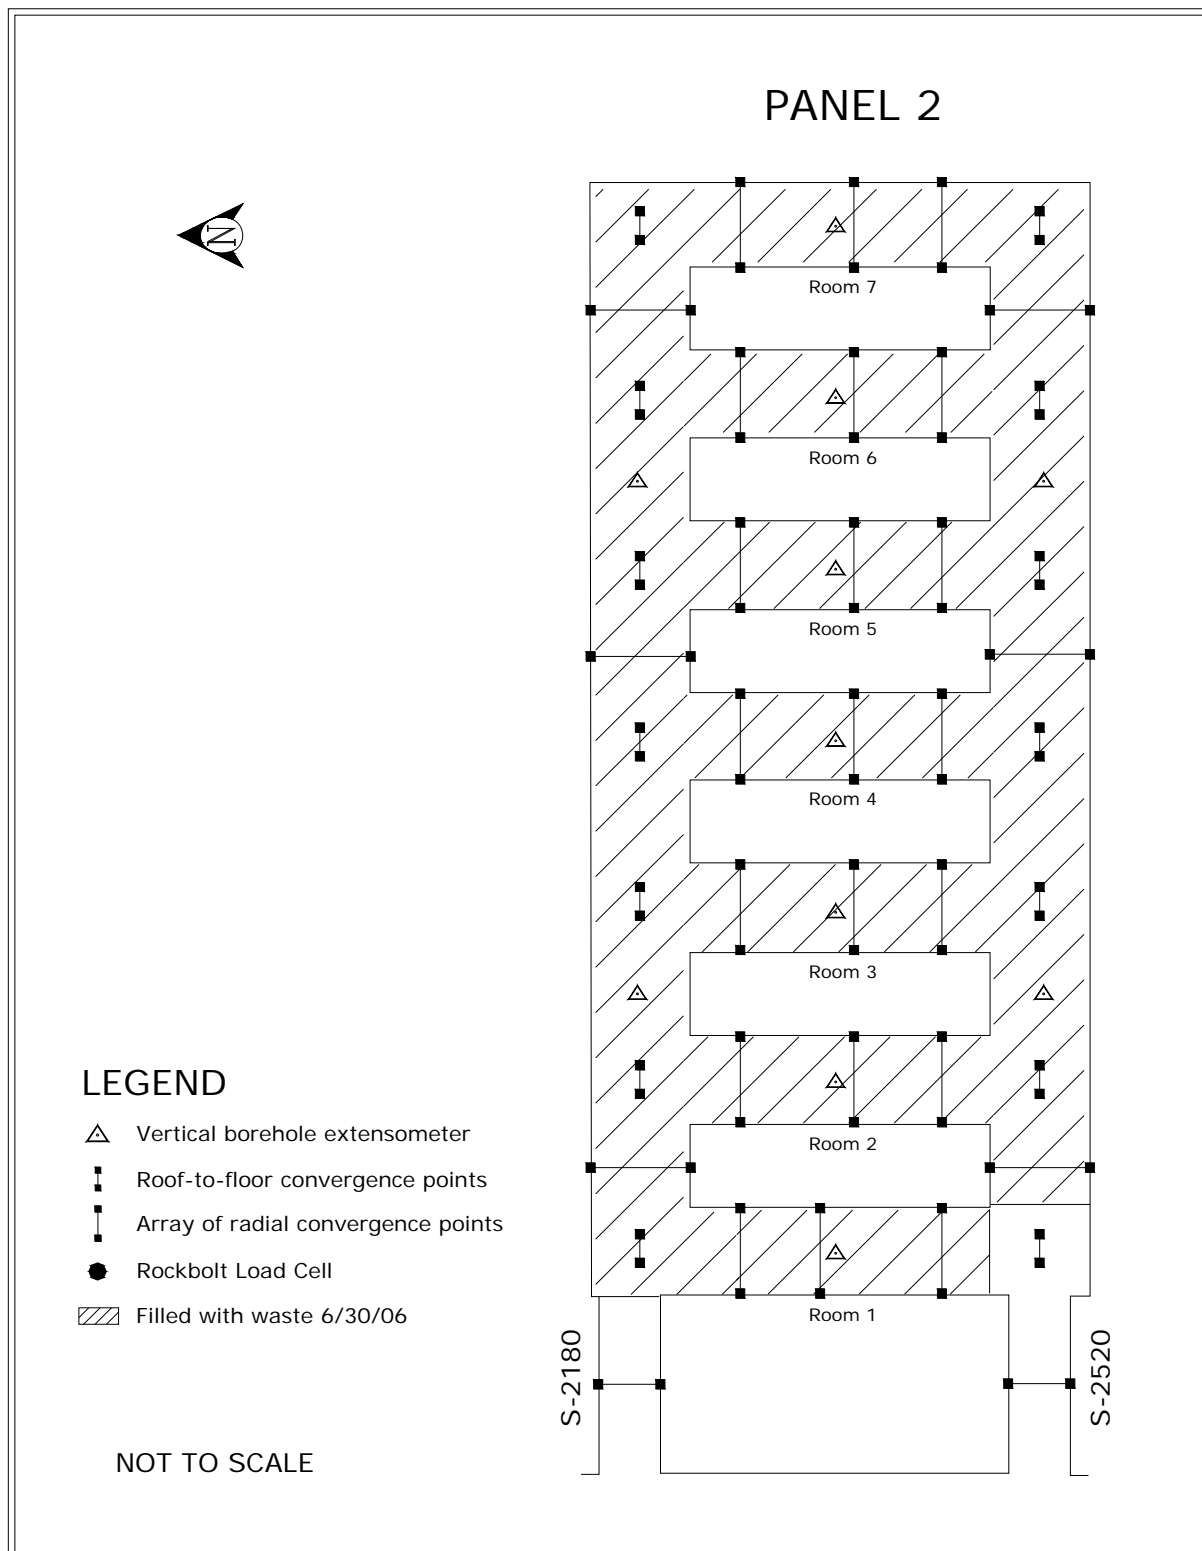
Location of Panel 2 Geotechnical Instruments
